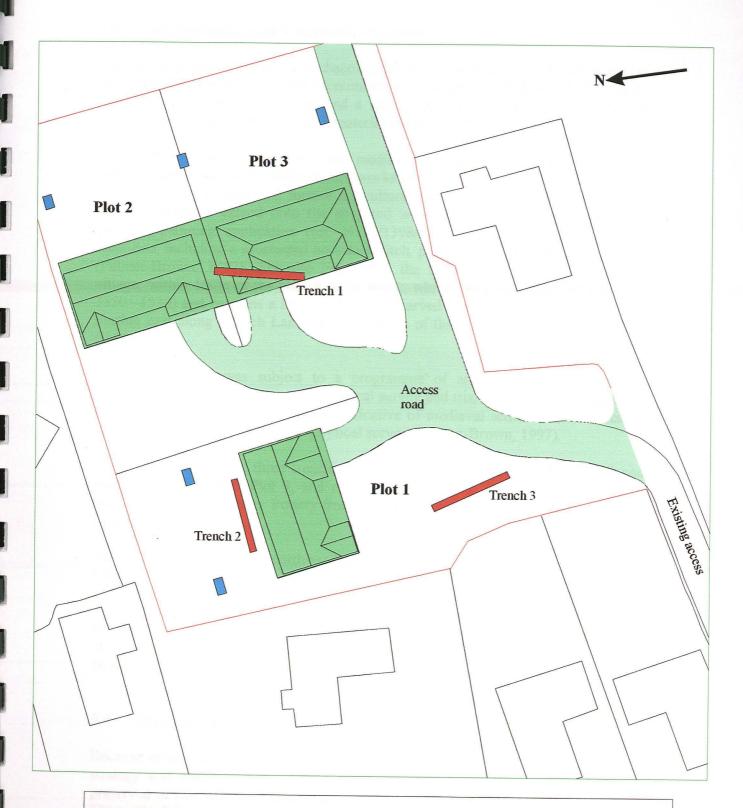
Development plan showing the stripped areas of the house plots and access road (in green). The former evaluation trenches are shown in red and the drainage pits in blue (scale 1:500).
